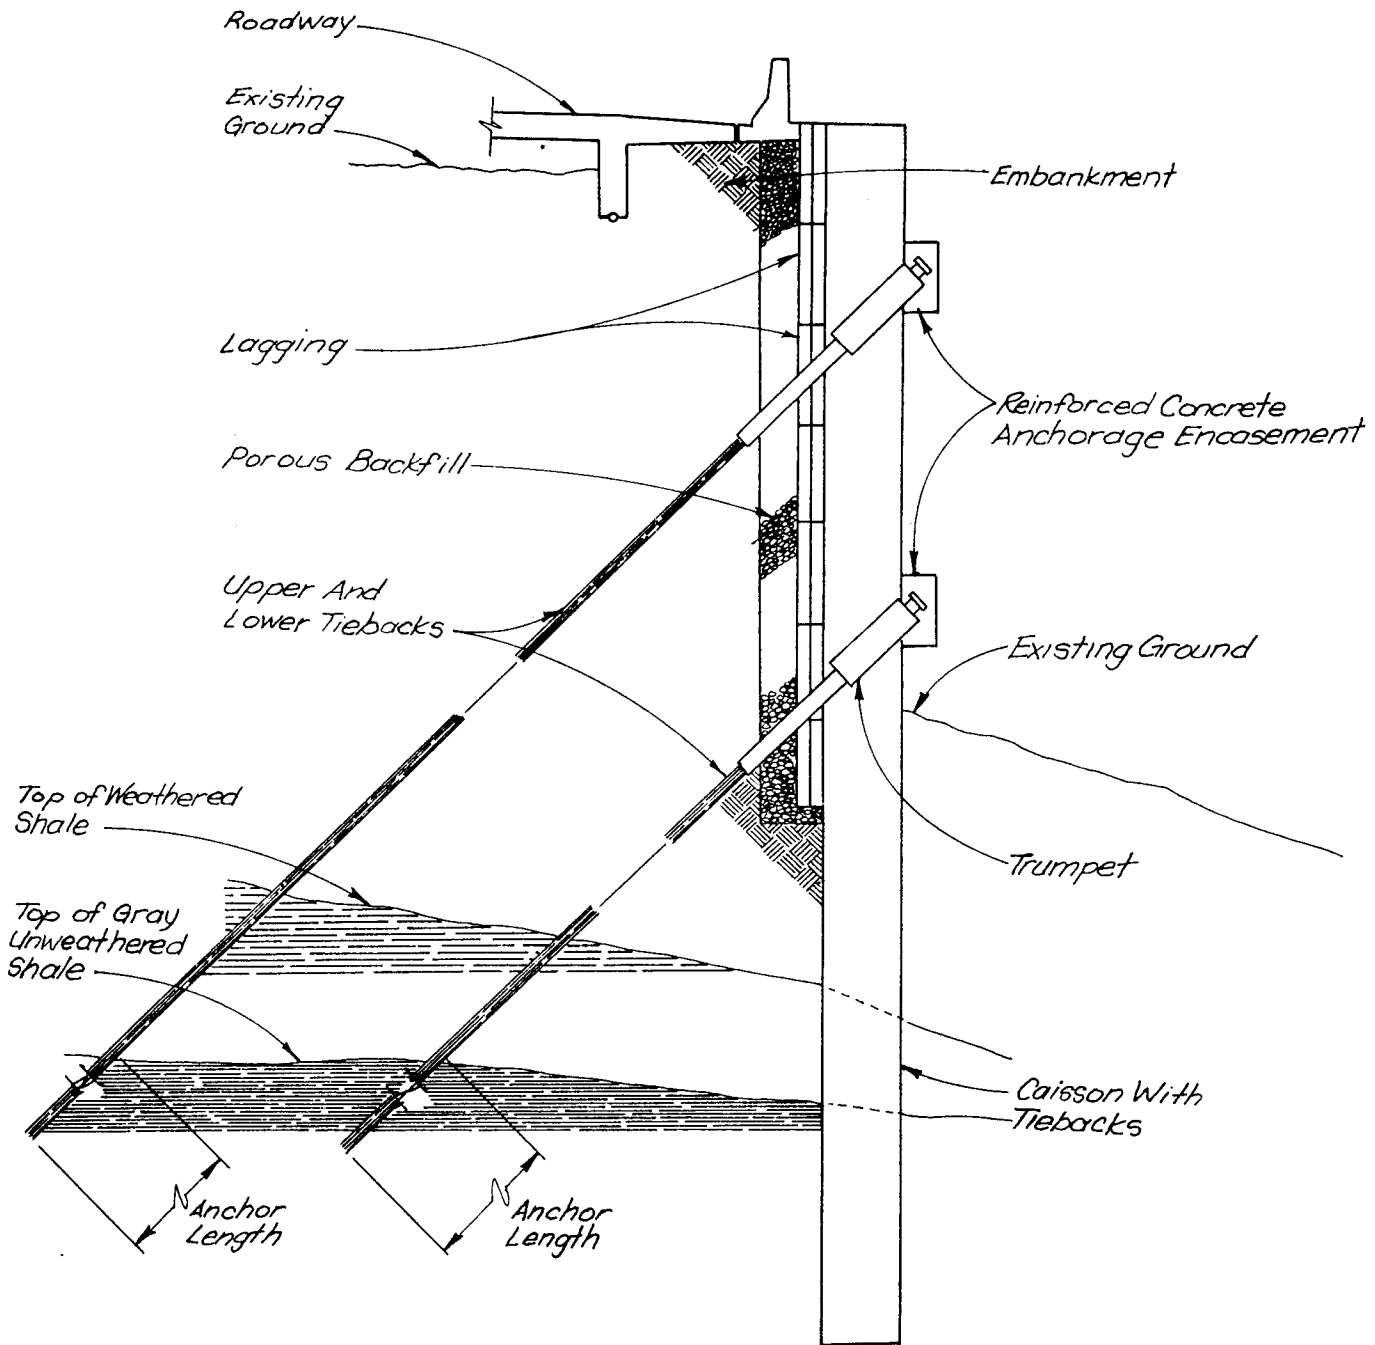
Design of a typical tied-back pier wall. Tied-back pier walls are similar to cantilevered pier walls, but resistance to sliding is increased by adding steel tiebacks anchored in stable shale bedrock.
